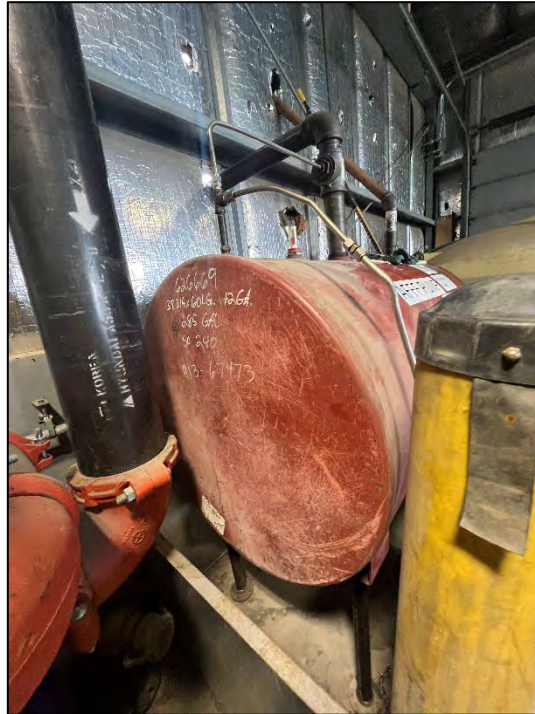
View looking east. East wall above diesel AST. Note fan near ceiling and various holes in the wall.
